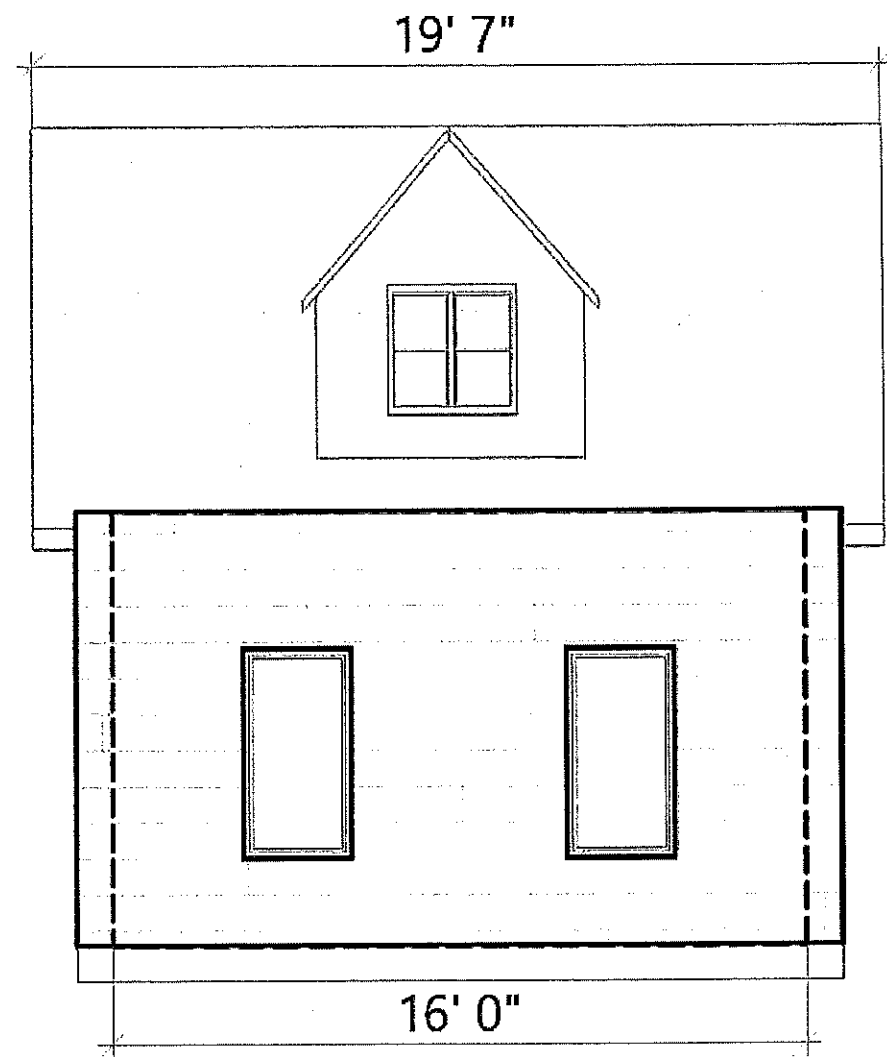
FRONT ELEVATION (EAST SIDE)
